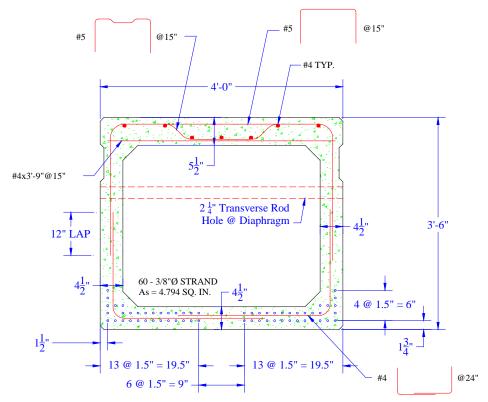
Span 2 Beam 16 of Lakeview Drive Bridge as per Structural Drawings
